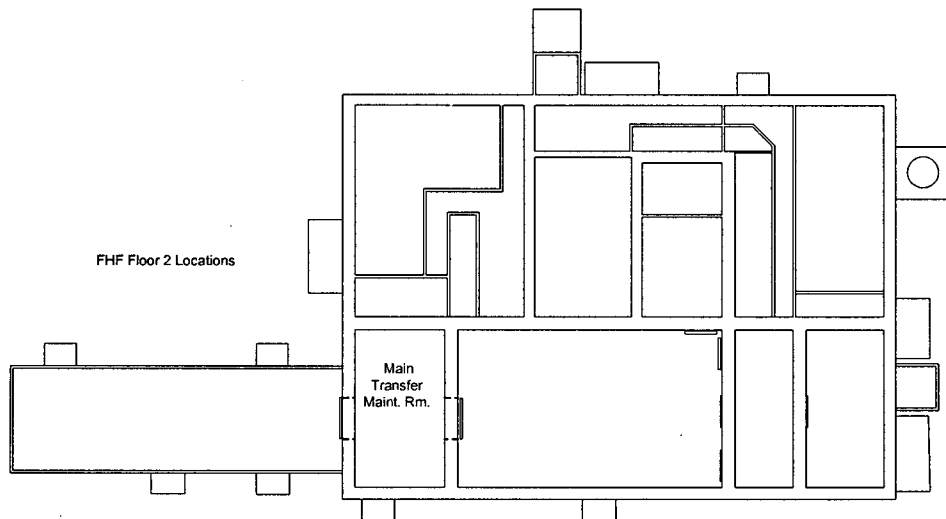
FHF 2nd Floor Room Arrangement El. 32'
